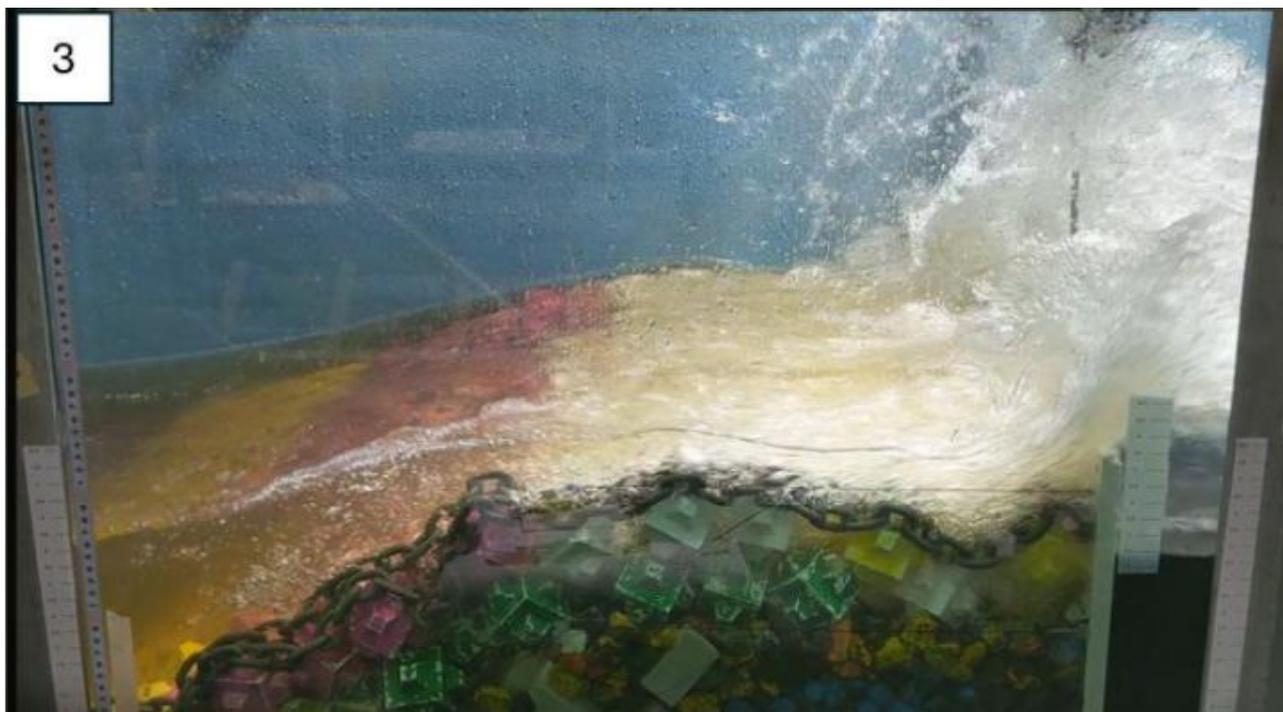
Overtopping with 1% AEP 2080 wave and water level conditions with seawall armour crest at existing seawall level and a vertical crest wall (UNSW WRL, 2024)
